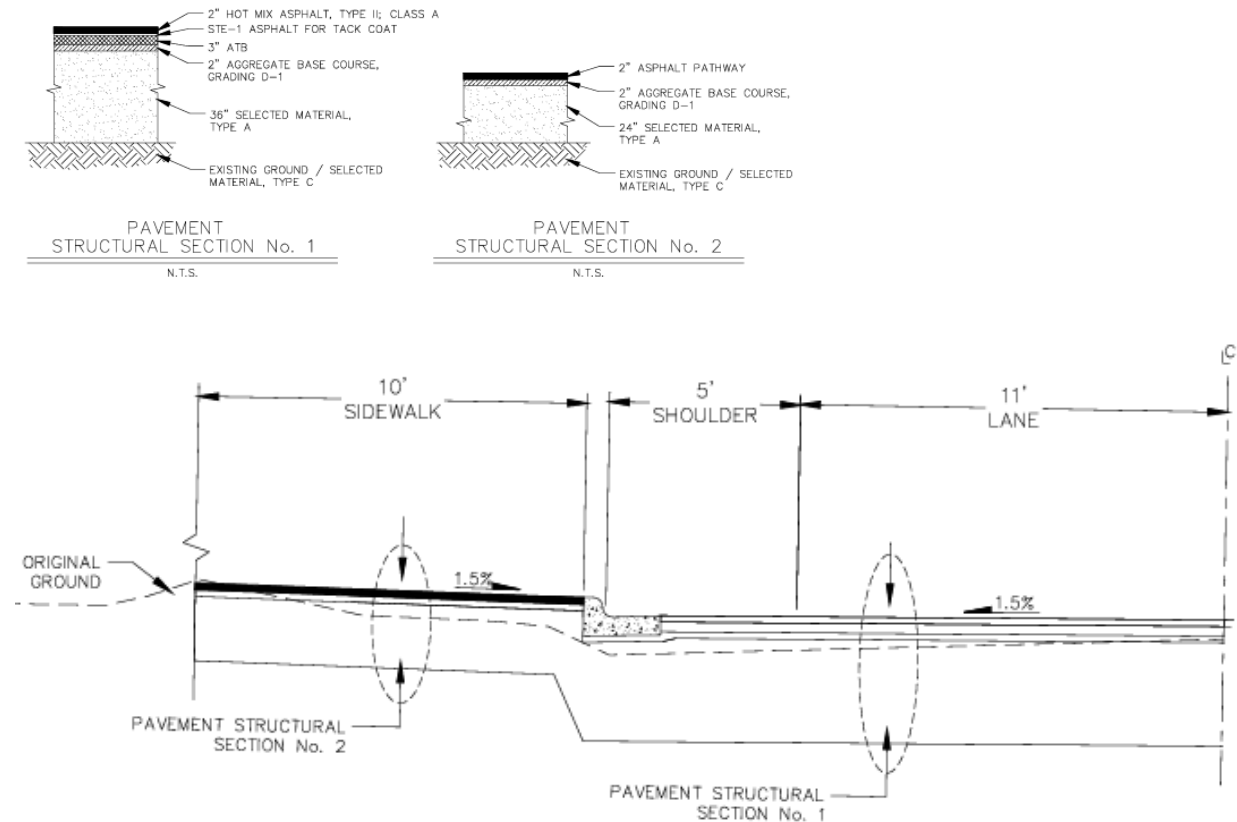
Shared Used Sidewalk Typical Section/ Structural sections
